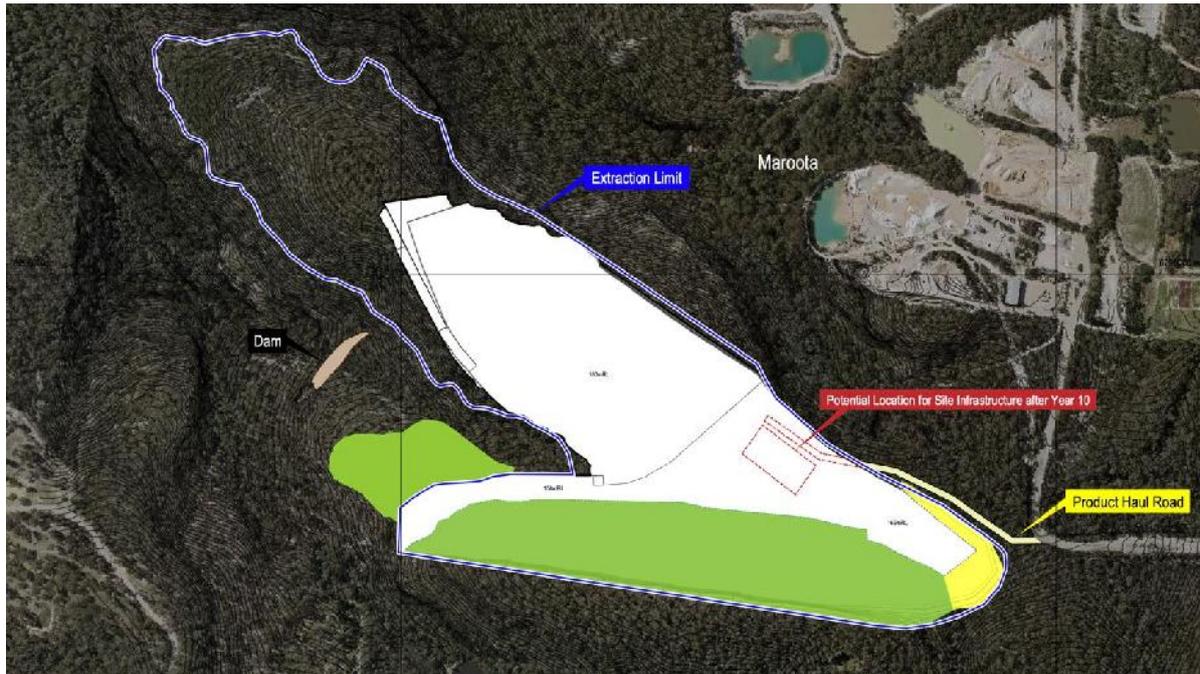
Extraction Sequence Plan Stage 4 (Source: RPM Global, 2021)
